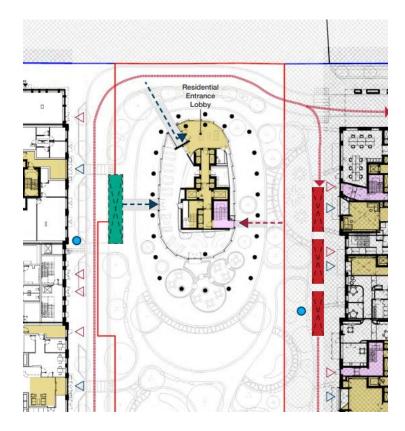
Plan showing ground floor of Plot C1 building. Phase 5 is edged in red
